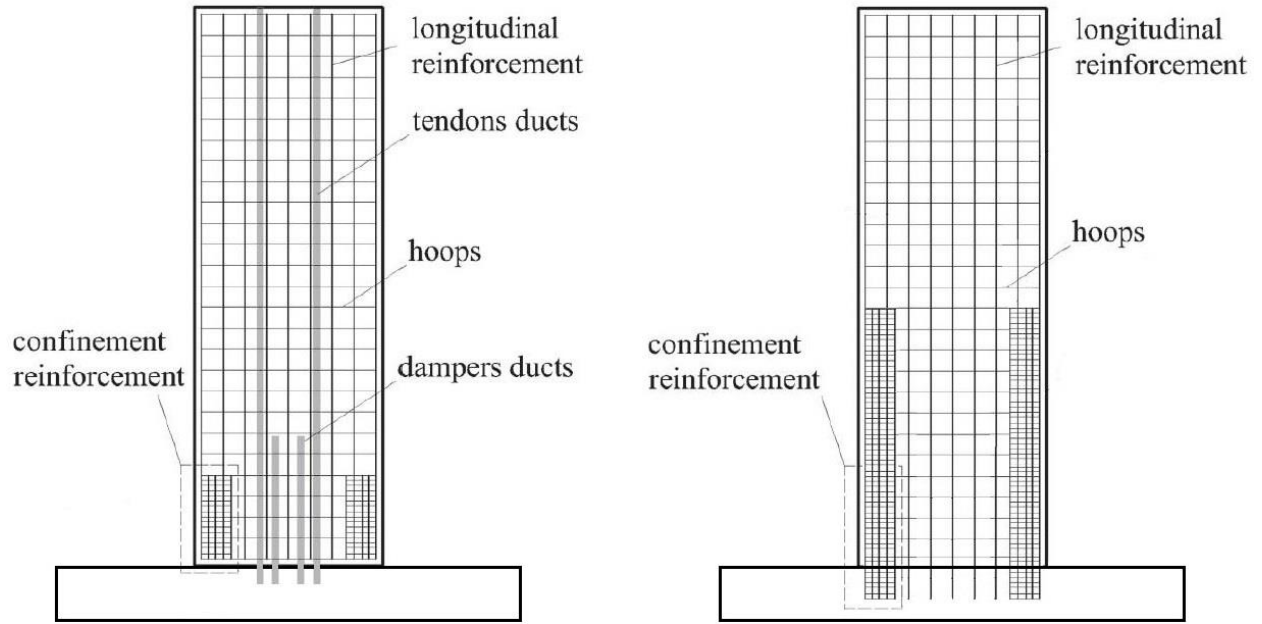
Rahman and Restepo (2000) rocking wall detailing (left) and conventional RC wall detailing (right) (adapted from Pennucci *et al.* (2009))
